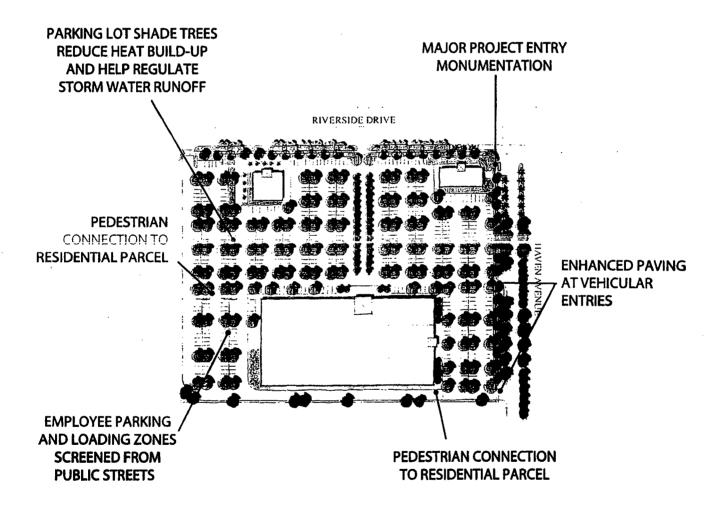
, "Neighborhood Center Commercial Site Planning Concept" presents a concept site plan for Neighborhood Center Commercial development. Please note that final site plans must meet the development standards and design guidelines contained herein.
